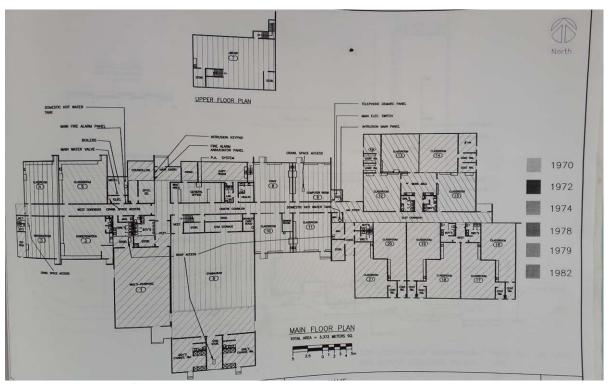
Floor plan of Parkview Elementary. Not to scale.
